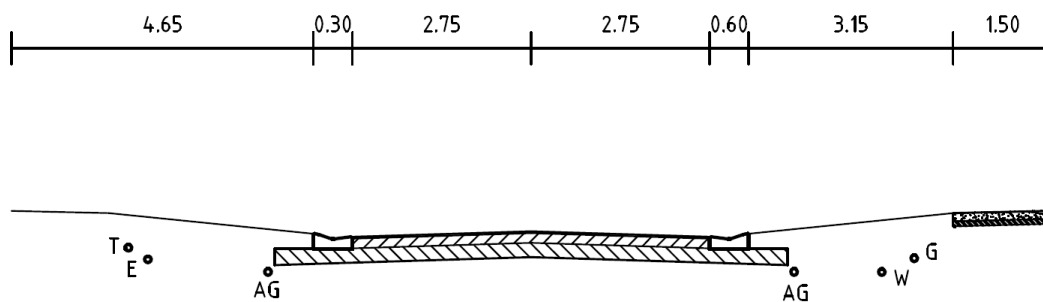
TYPICAL YOUNGER STREET CROSS SECTION
